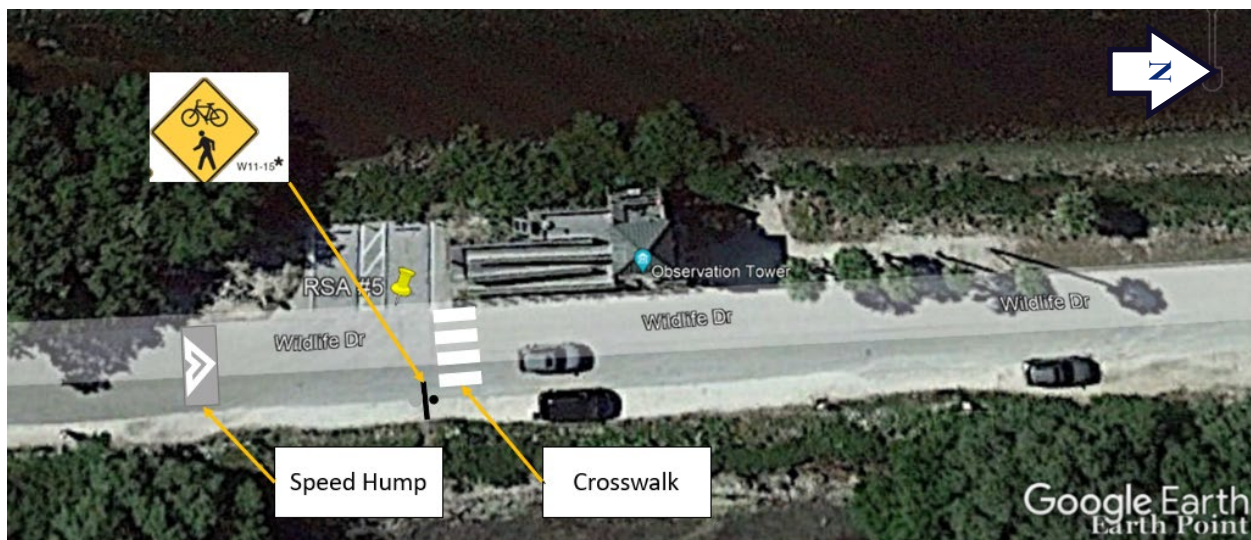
Observation Tower Site Safety Improvements<sup>3</sup>
